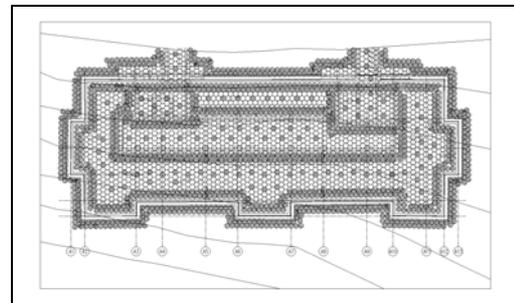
Soil-improvement with jet-grouting under the historical walls and the new structure.
